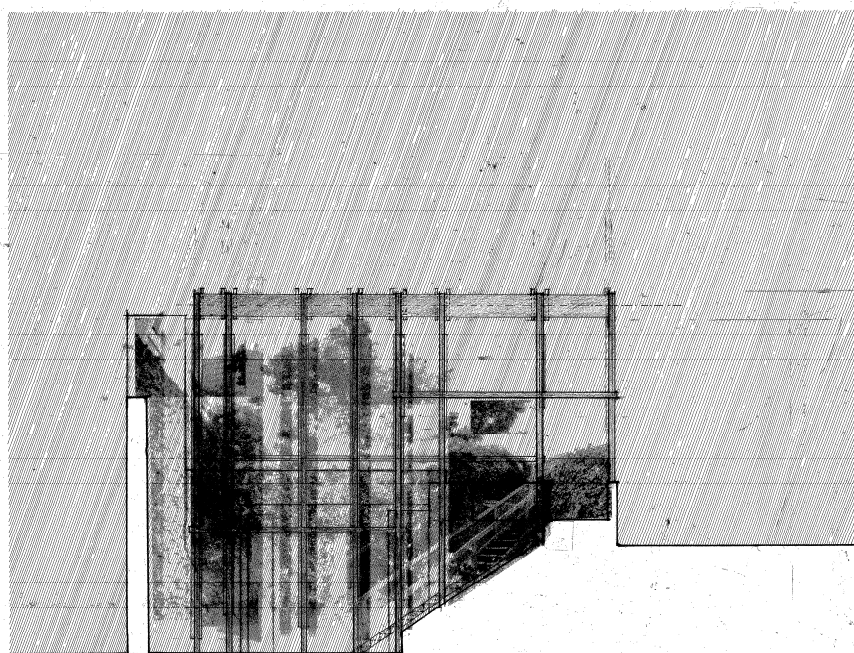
Proposed portico and chimes, west staircase, section through low level garden, looking east towards upper garden.
